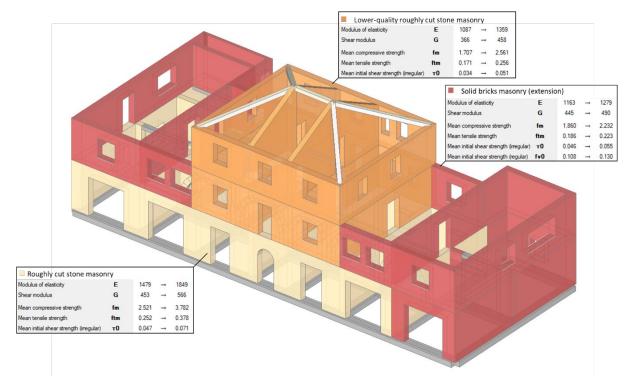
Model (A.5): Strengthening intervention with reinforced repointing applied to the entire building
